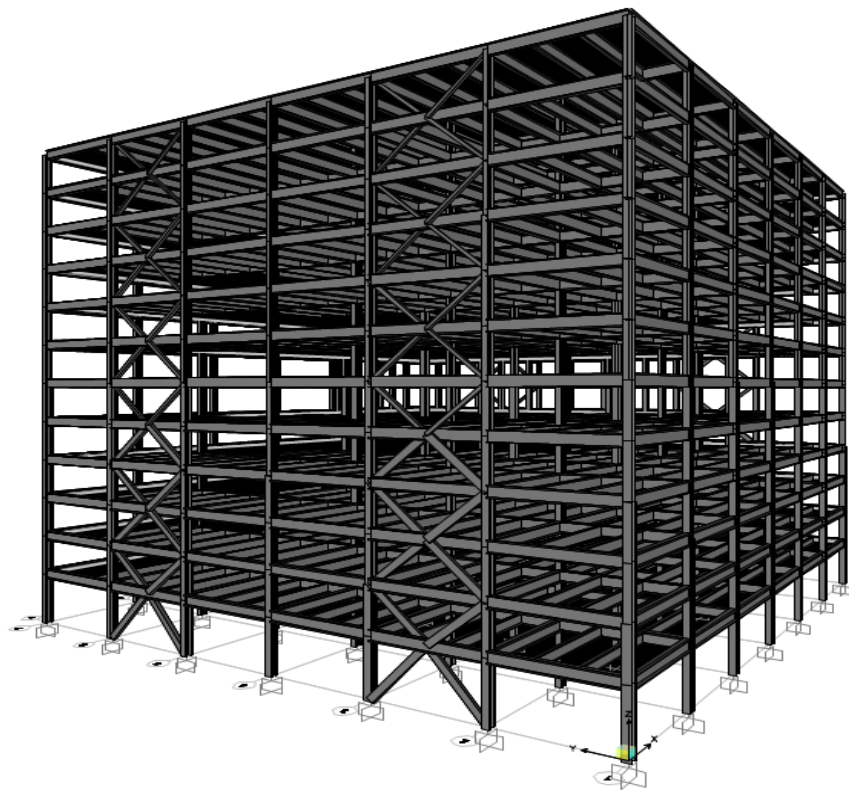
1 Three-dimensional structural rendering of the steel-frame building view.
